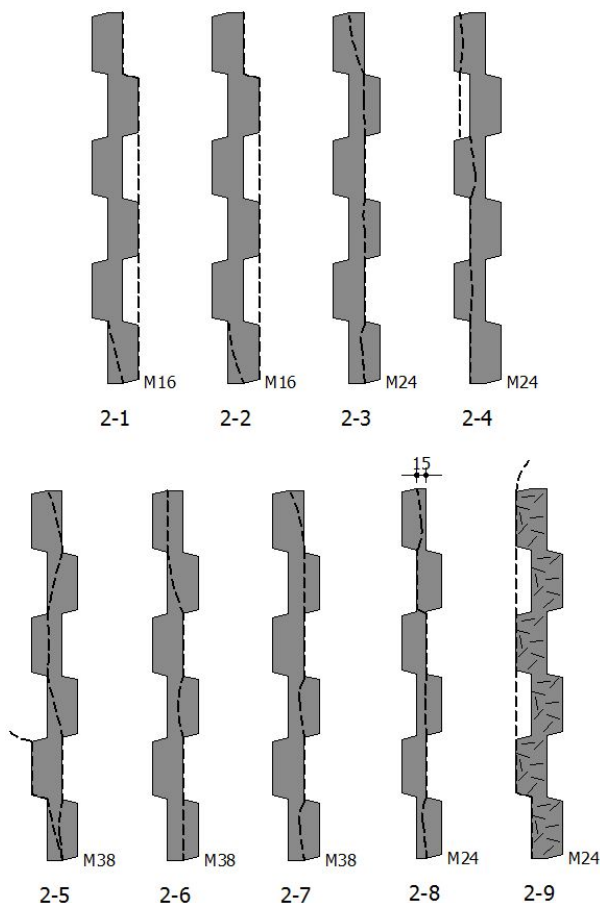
Failure cracks for all tested Staggered shear key connections
